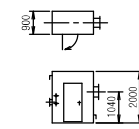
POSITIONS OF DOORS, TERMINAL BOX AND FLANGE
